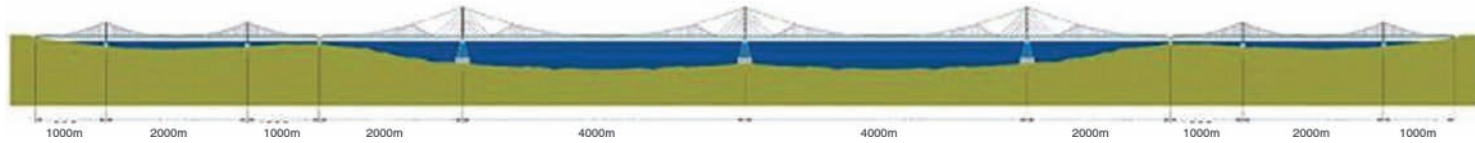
Longitudinal elevation of the Tsugaru Strait proposal.
